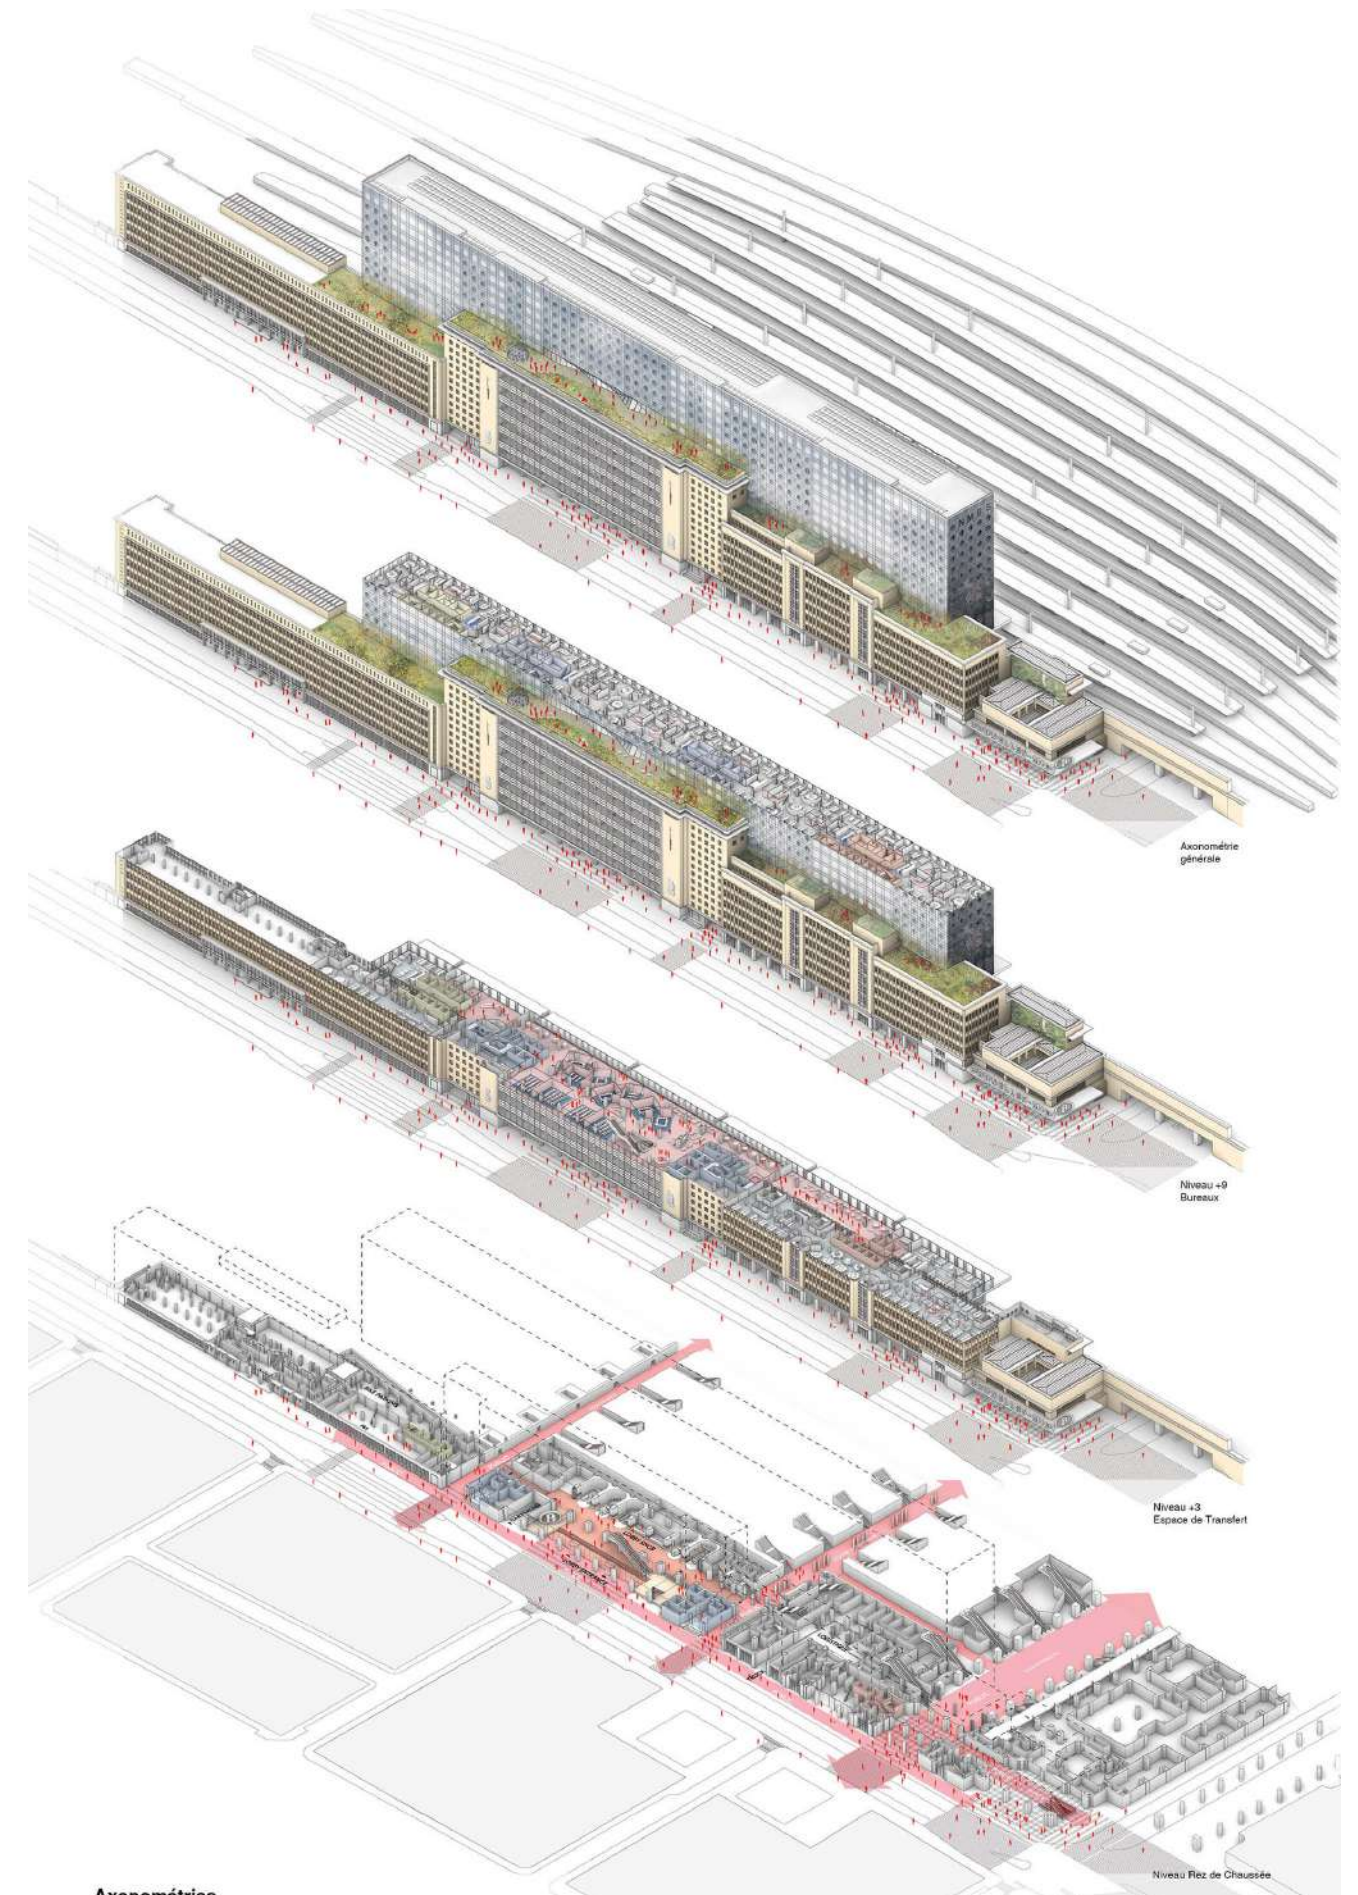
Plan by OMA to renovate and extent the current building. Source: OMA
